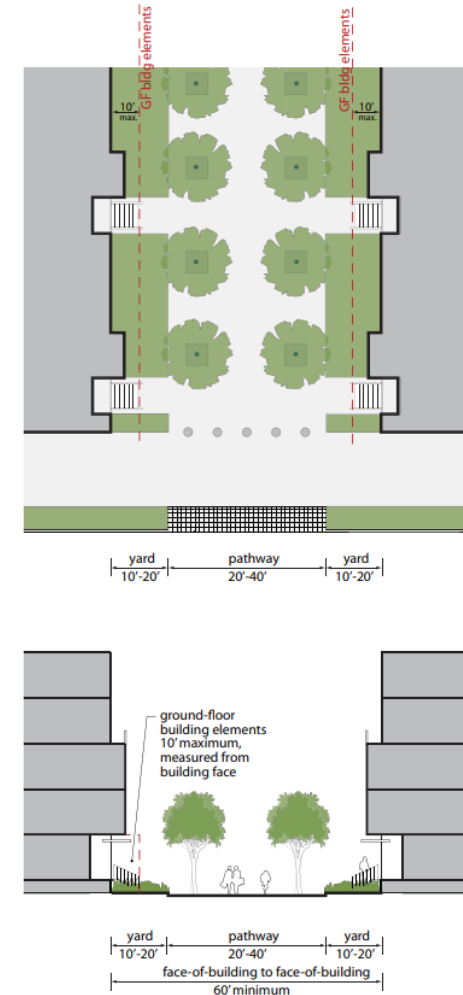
Proposed Cross Section for Paseos (North San José Area Design Guidelines)
